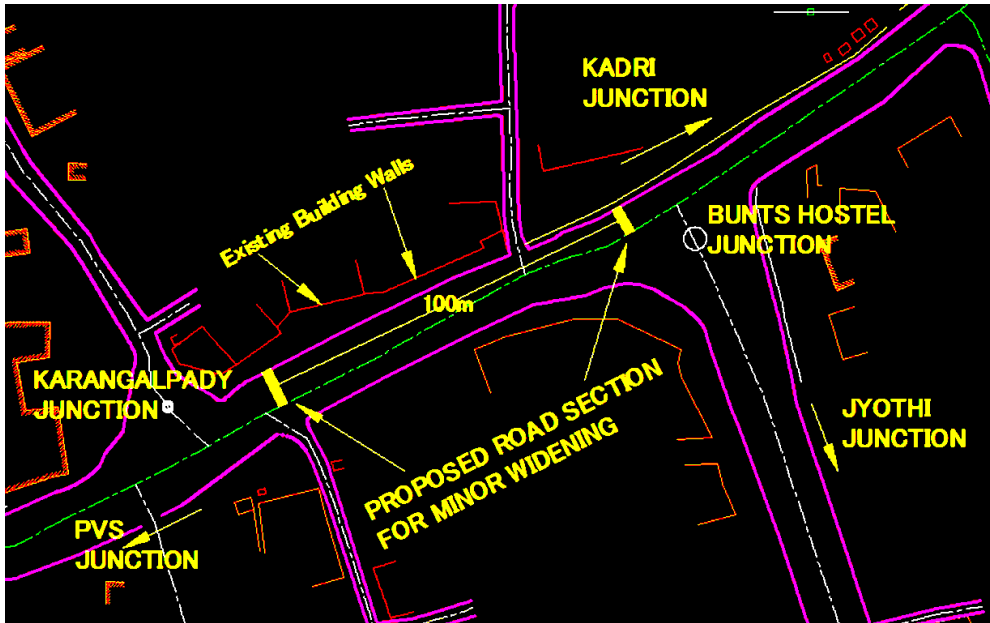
Details on the Existing Layout between Karangalpady Junction and Bunt’s Hostel Junction
